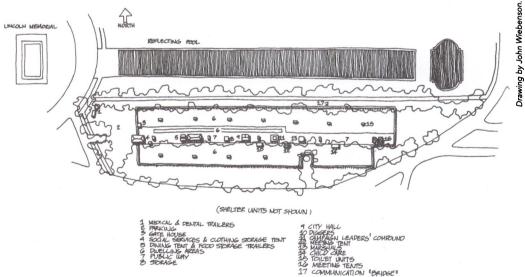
Resurrection City, 1968, as built plan, shelter units not shown.
